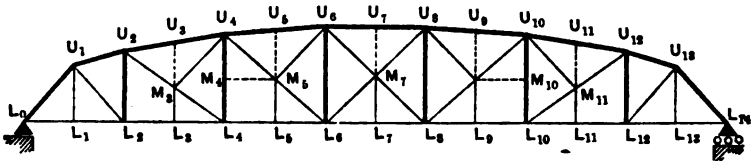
Broken Upper-chord Truss with Sub-divided Panels.
